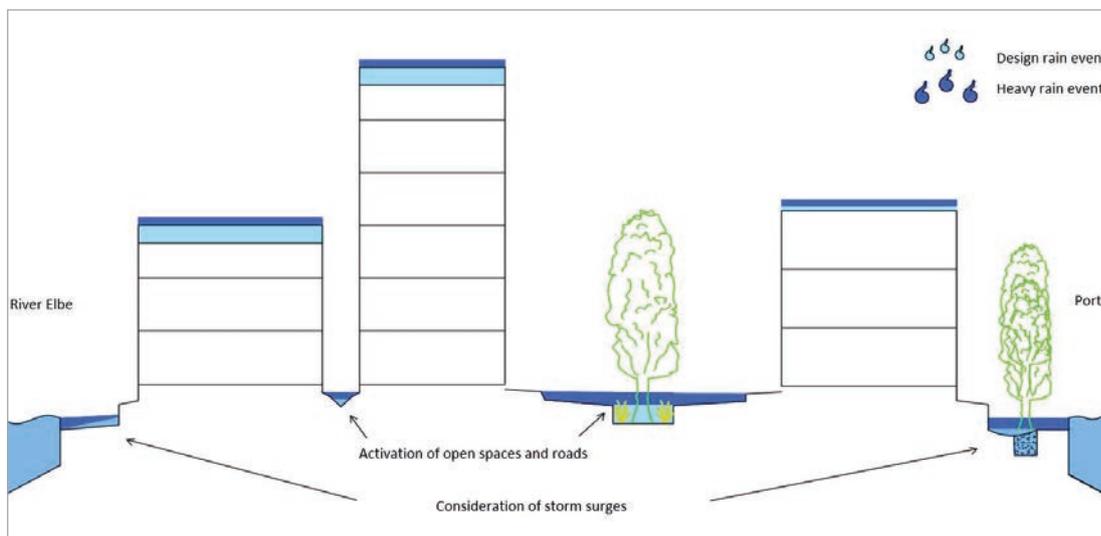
| Diagrammatic section – Safe drainage in heavy rainstorms
